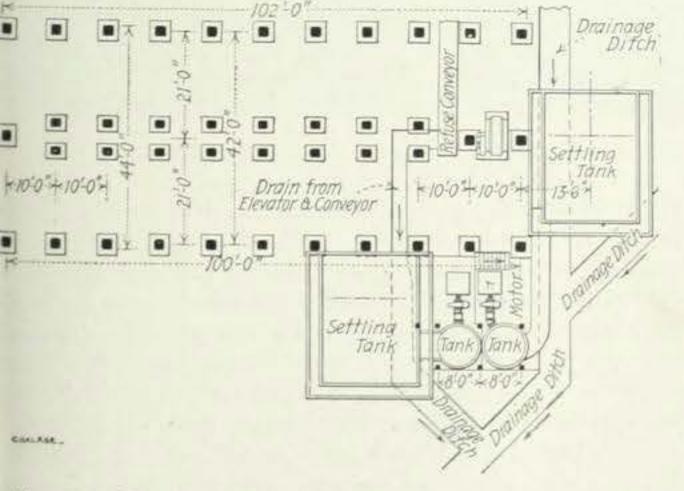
GENERAL FOUNDATION PLAN OF WASHER
